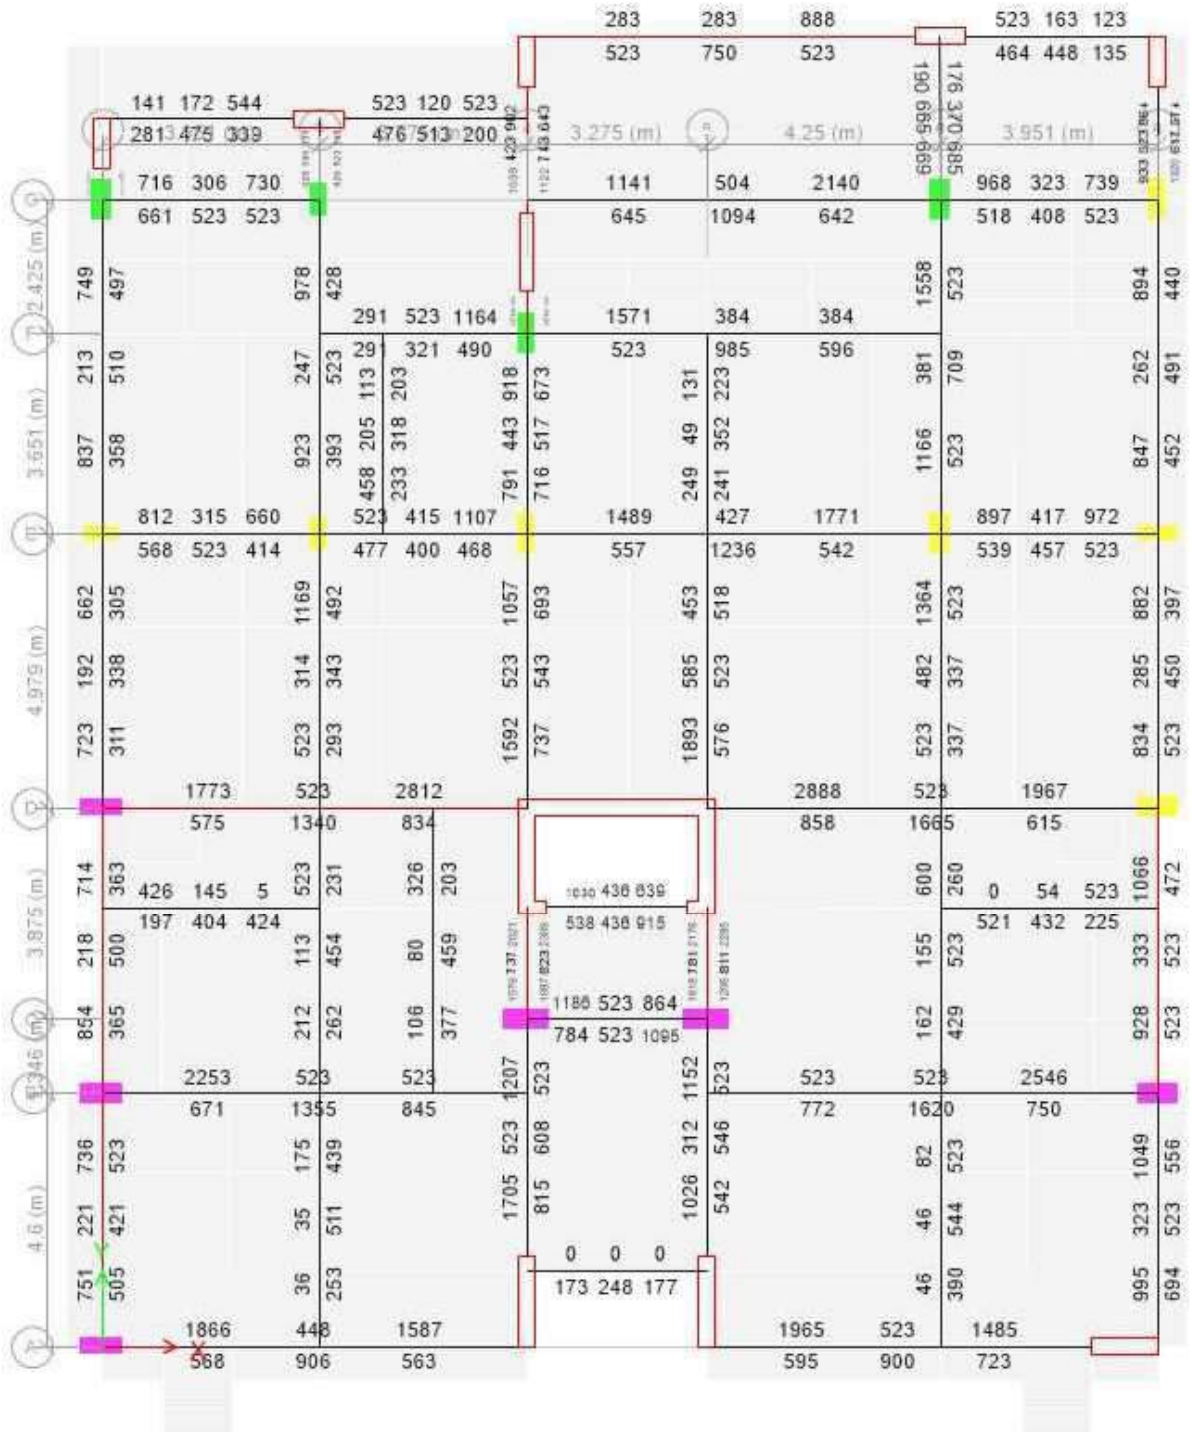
Reinforcement of 1st Floor Beam (mm²)
